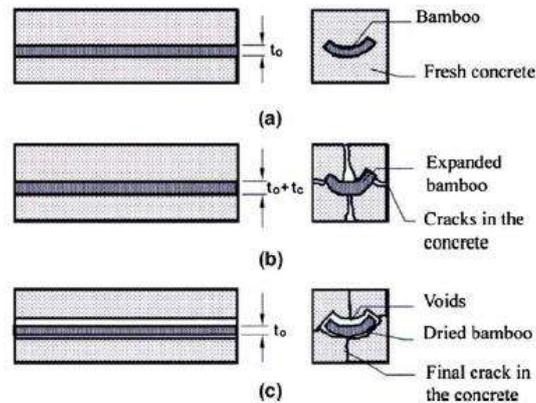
Behaviour of untreated segment bamboo as reinforcement in concrete: (a) bamboo in fresh concrete, (b) bamboo during curing of concrete and (c) bamboo after cured concrete.
